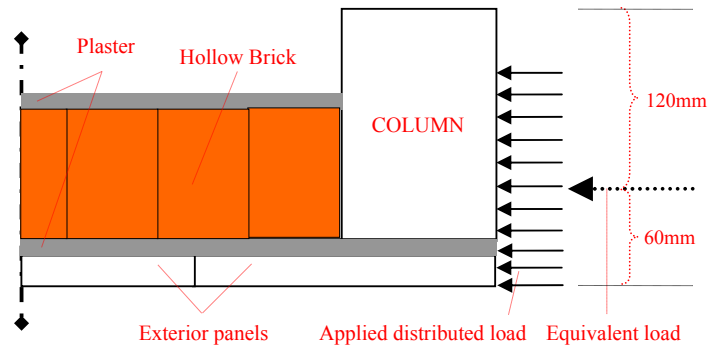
Load application on to the Specimens CEF4, CEE1 and CEER
